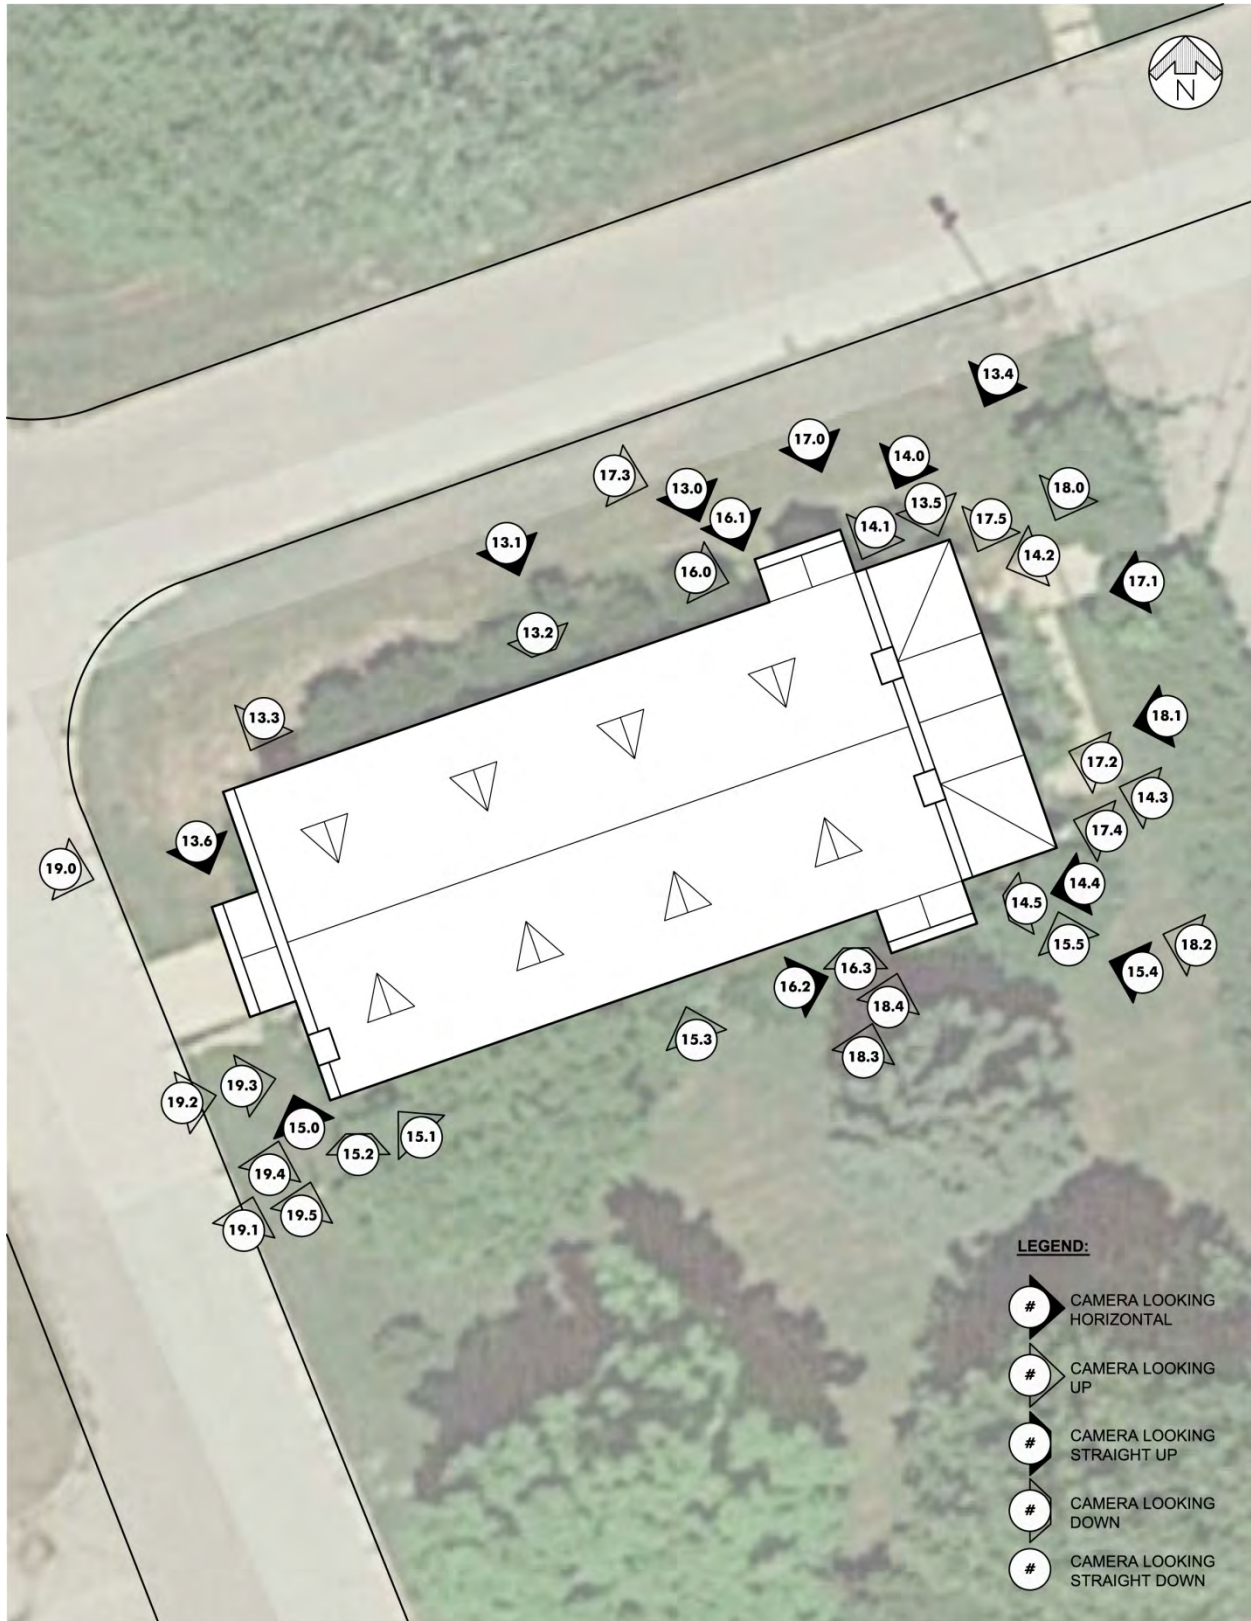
Photo No. 13.0 – 19.5 (Rainwater and Chimneys)
